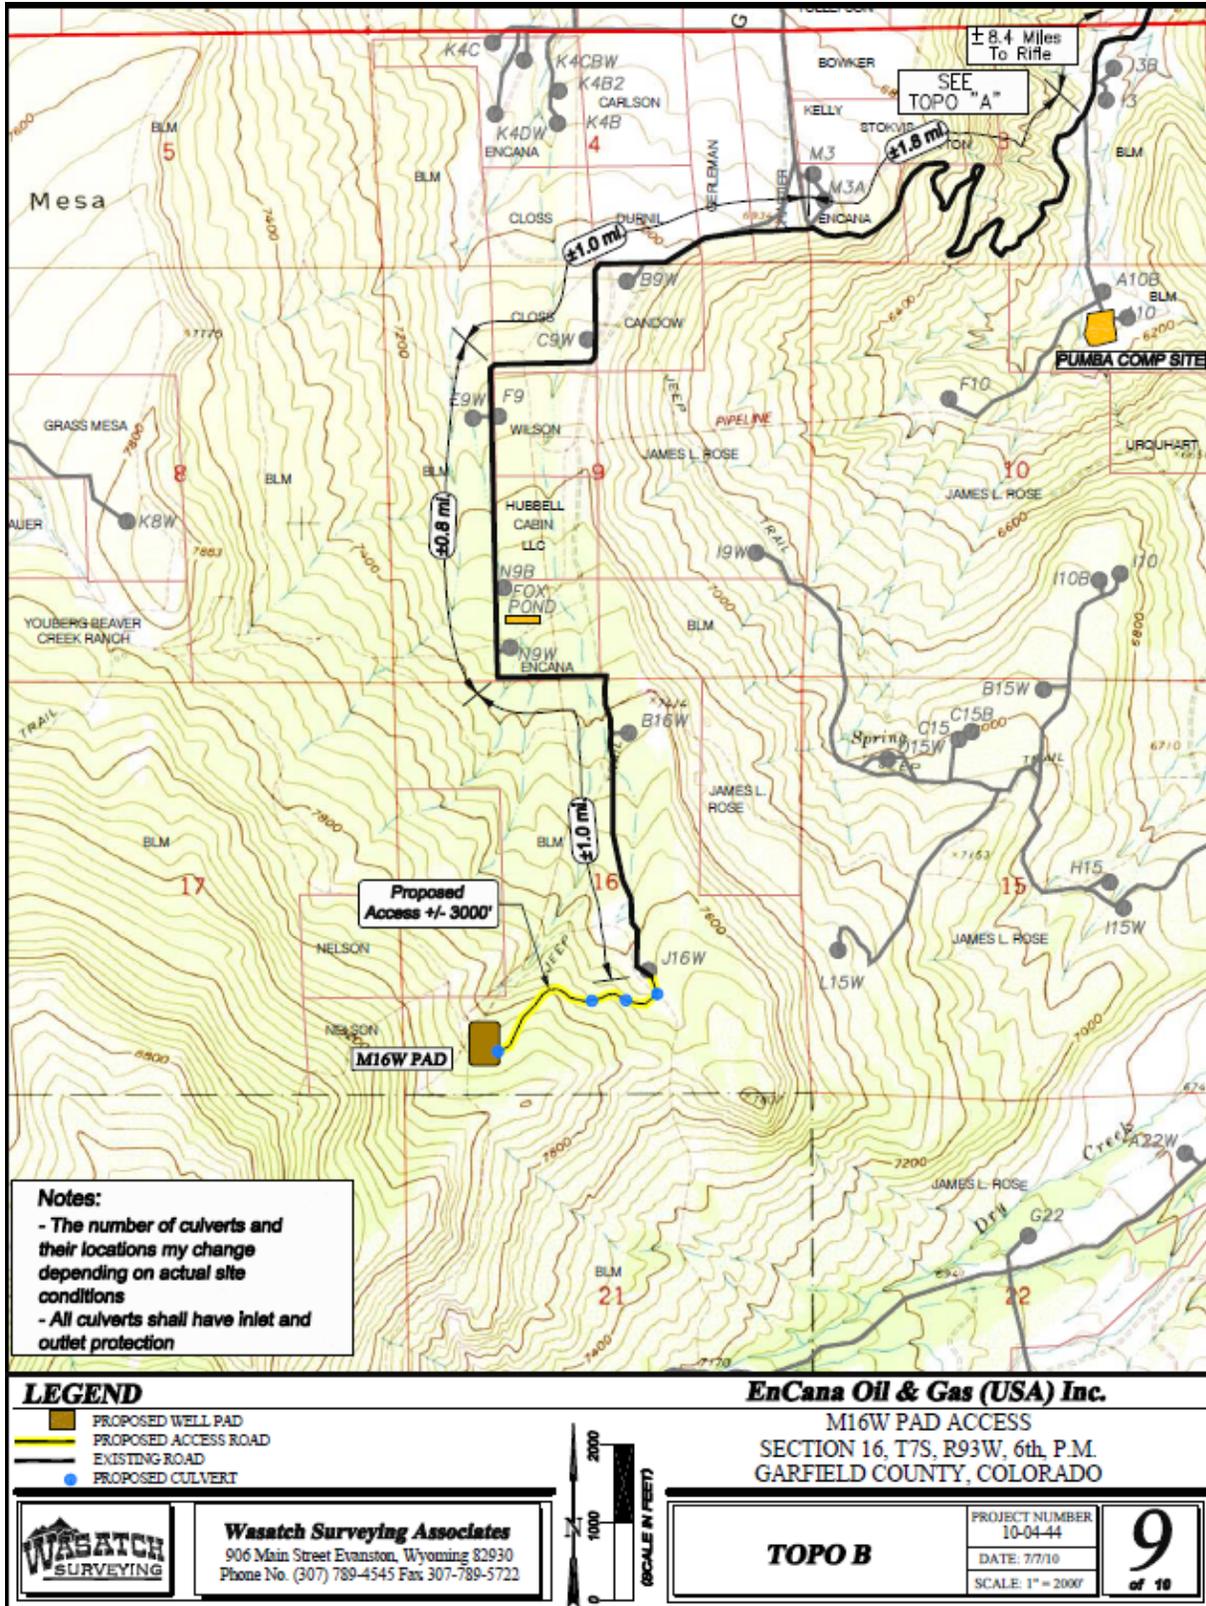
Proposed M16W pad & road location (gas & water pipelines to be buried along road).
